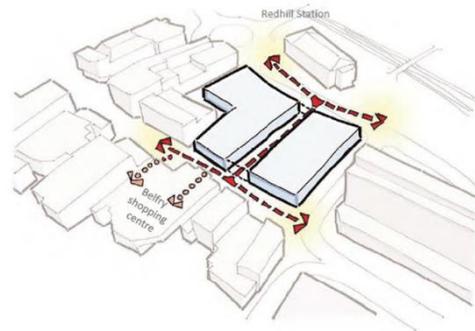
Marketfield Way Redhill - A mixed-use development providing new multi-screen cinema and flexible retail, restaurant and café units on ground floor with residential apartments above, granted under planning permission 16/01066/F. Buildings comprising part five, part six, part ten and part thirteen storeys with accompanying car parking and cycle storage, offer a dual frontage, facing onto both High Street and Marketfield Way with central break providing pedestrian access via a partially covered colonnade, helping to better connect and link the train station and south end of the High Street. The design and materials of the cinema and residential elements are quite different, intentionally so, to reflect their contrasting uses.
